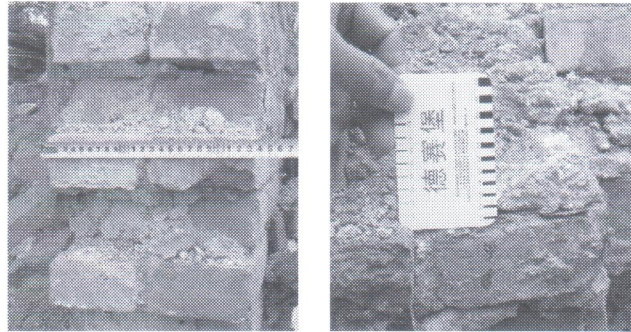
Construction of masonry built with lime-earth mortar (left) and bituminous sheet (right) as rising damp barrier
